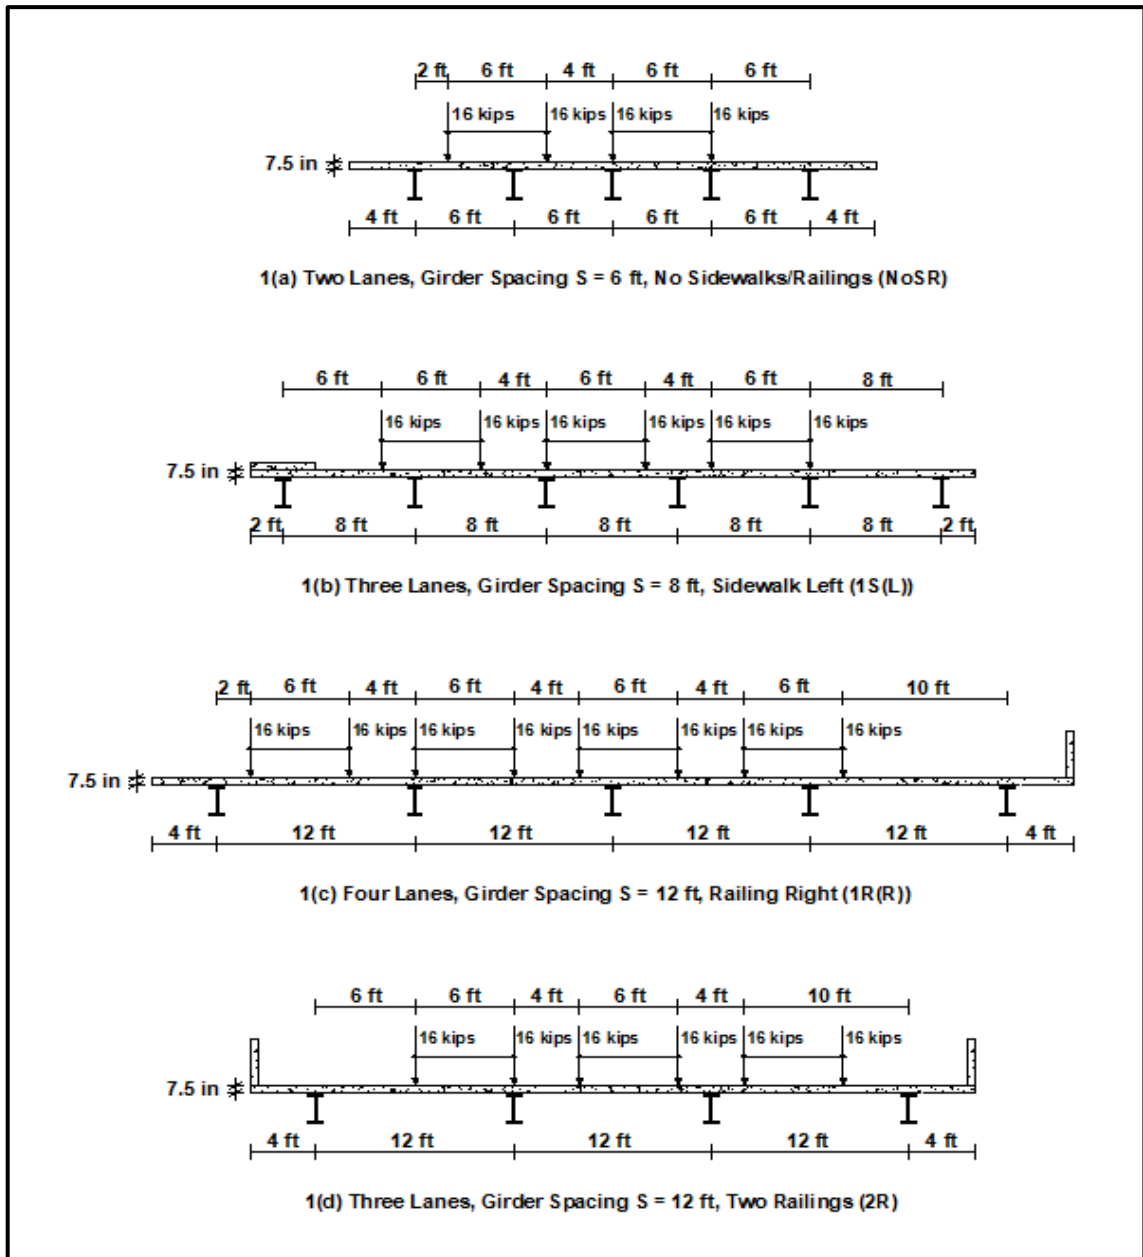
Typical Bridge Cross-Sections, with and without Sidewalks and/or Railings (Nuwayhid et al. 2015)
